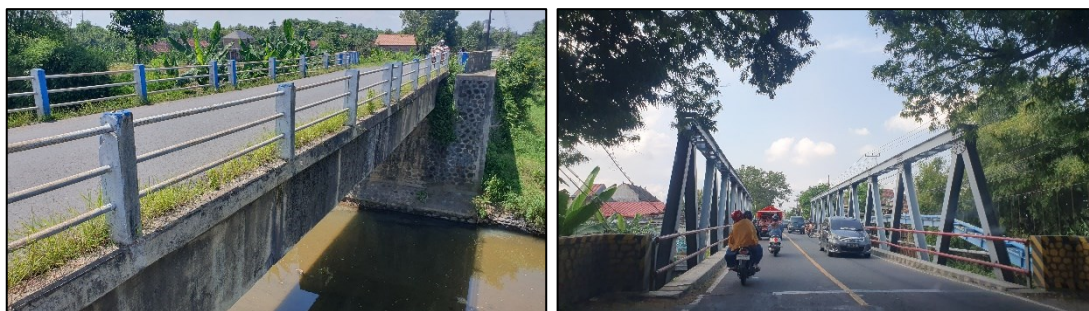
An example of an old concrete bridge (left; from 1970) and steel bridge (right). Both bridges are between Ponorogo city center and the site.
